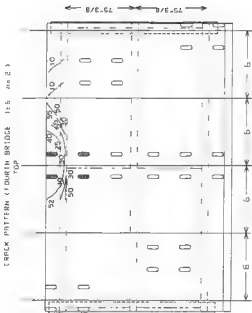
Top Cracking Pattern (Fourth Bridge - Test No 2)
